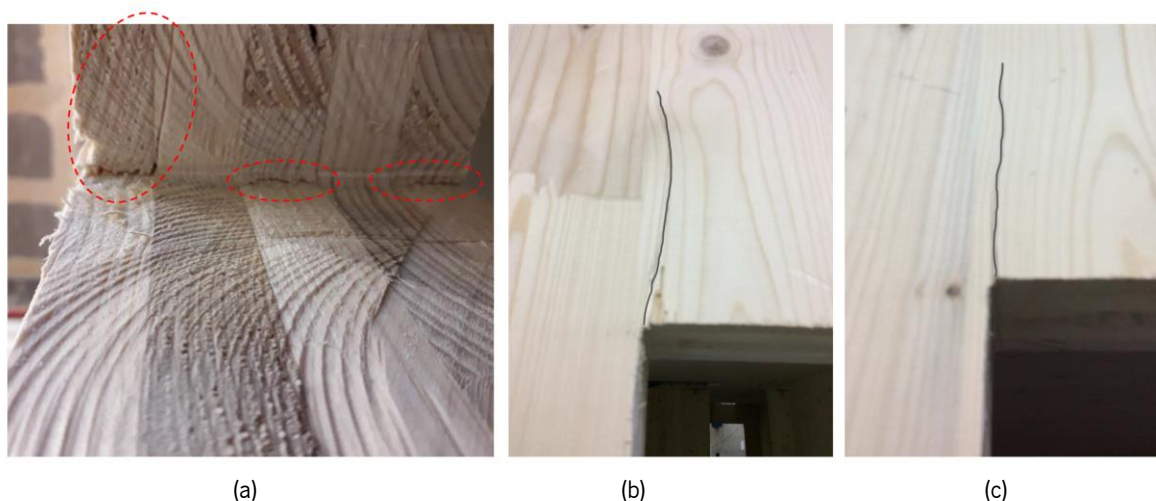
Cracks on the top left corner of the openings 1500x2000 (a and b) and 900x2000 (c) on the ground floor wall in the facade B-B' during the monotonic transverse test
